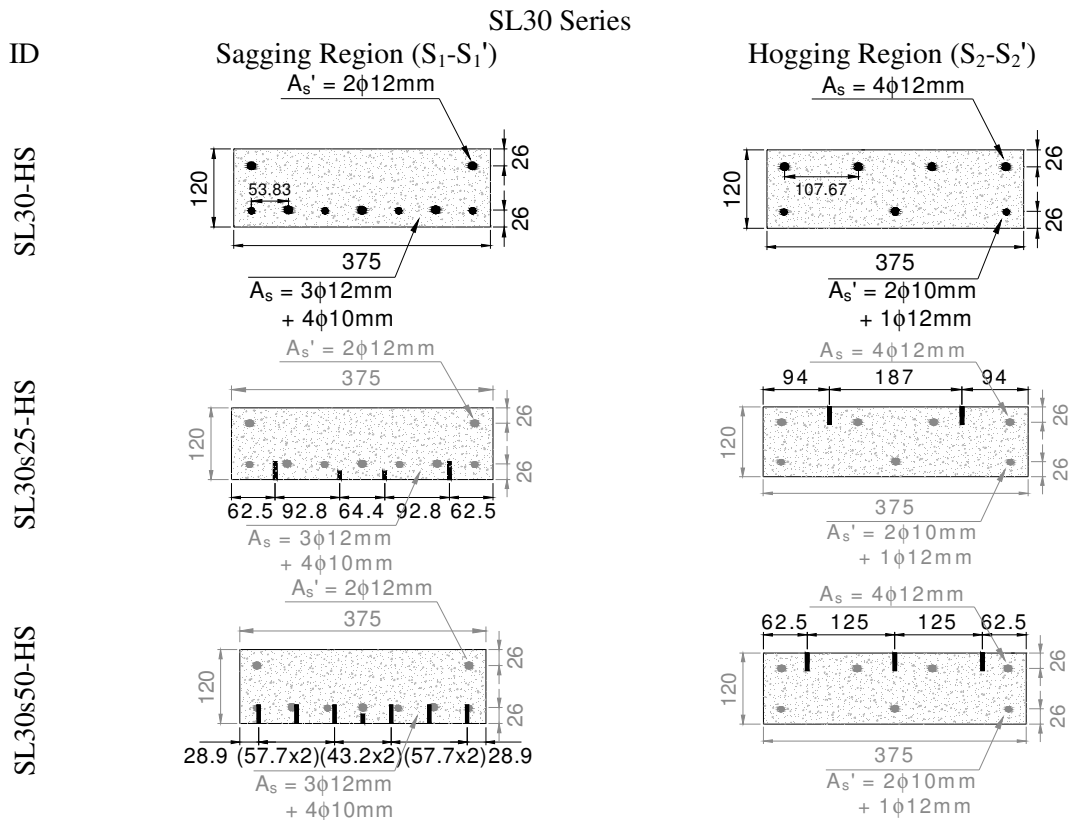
Slab strips of the SL30-HS series: specimen's cross-sectional dimensions, reinforcement and strengthening of sagging (S₁-S₁') and hogging regions (S₂-S₂'). Dimensions in mm
